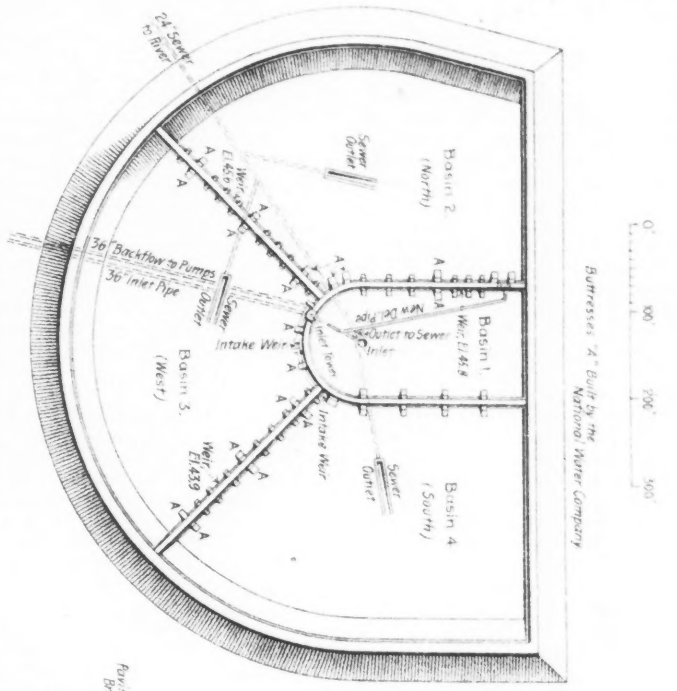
PLAN OF SETTLING BASINS, SHOWING POSITION OF REINFORCING BUTRESSES AND WALL.
